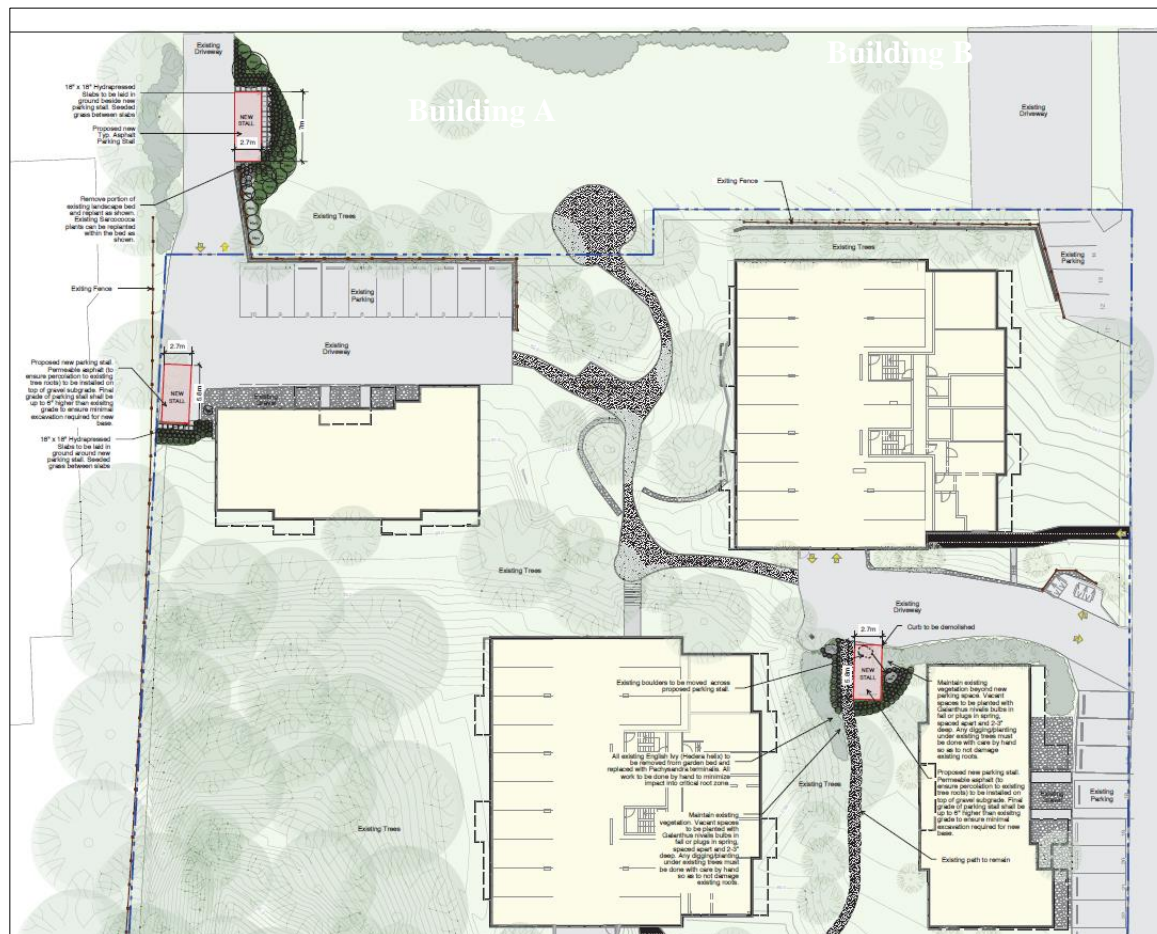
Landscape Site Plan (new parking spaces indicated in red; blue line indicates property boundary) of approved variance at 14989 Roper Avenue (19-023)
